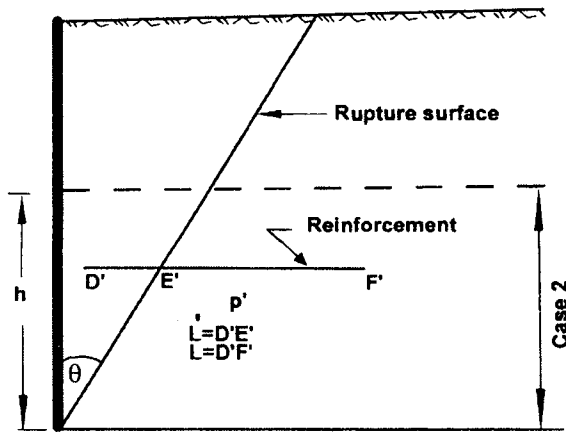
Section of Rigid Wall with Reinforced Backfill
